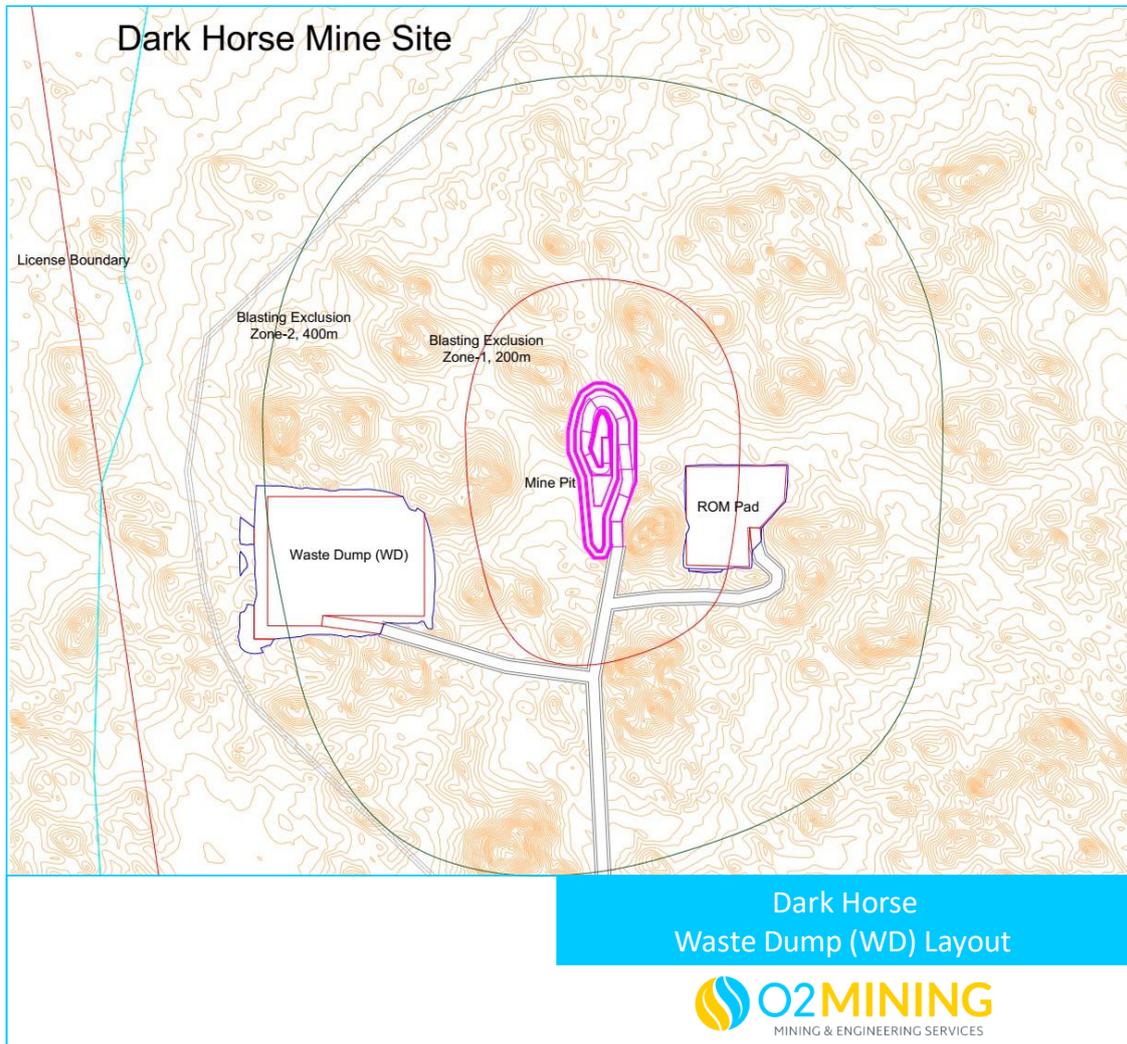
DH Waste Dump (“WD”) Layout (Source O2 2023)
